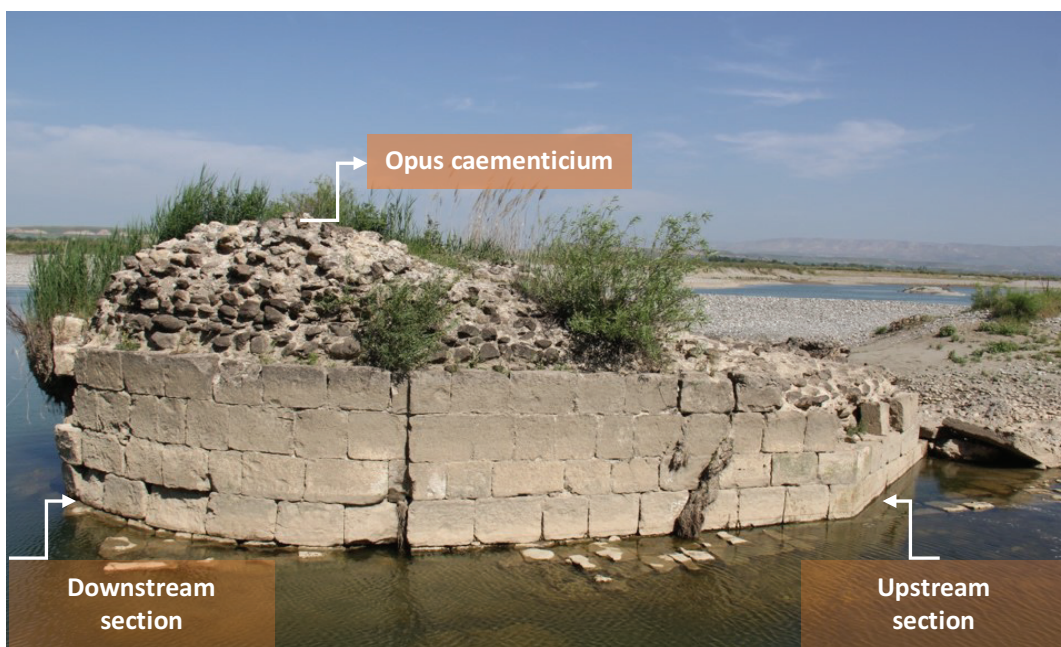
Sections of a pier/foundation of the Perpira Bridge
